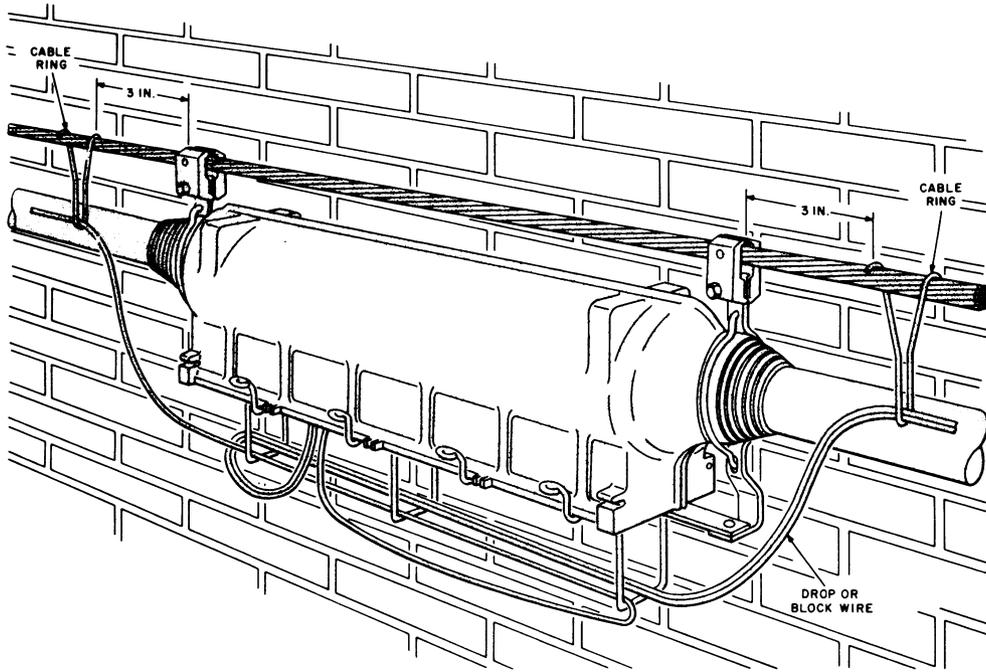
Wall-Mounted 49-Type Cable Terminal
